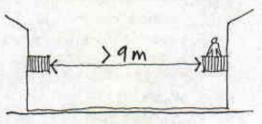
Offsetting windows to avoid outlook to adjacent private areas.
